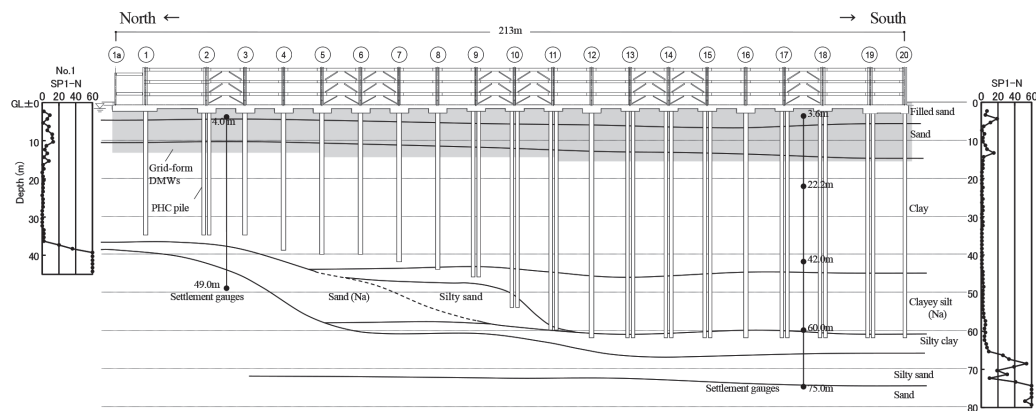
Building and foundation with monitoring equipment locations: longitudinal view with soil profiles
